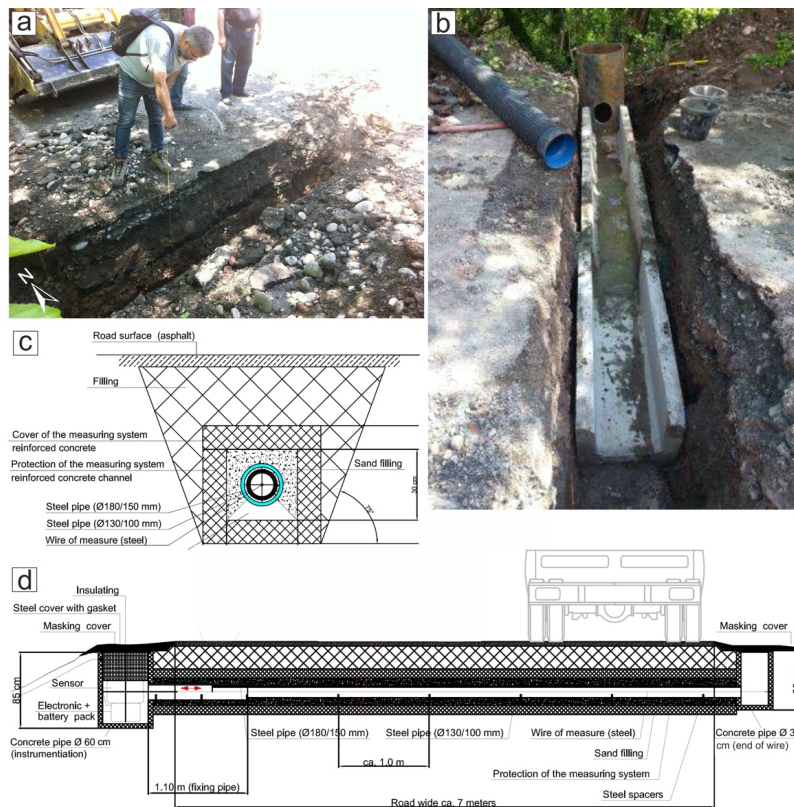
(a) Opening of trench n. 1. (b) Installation of the concrete protection for the extensometer. (c) Section transversal to the extensometer system. (d) Longitudinal section of the extensometer system. Location of the two measurement stations provided in Figure 3a.
